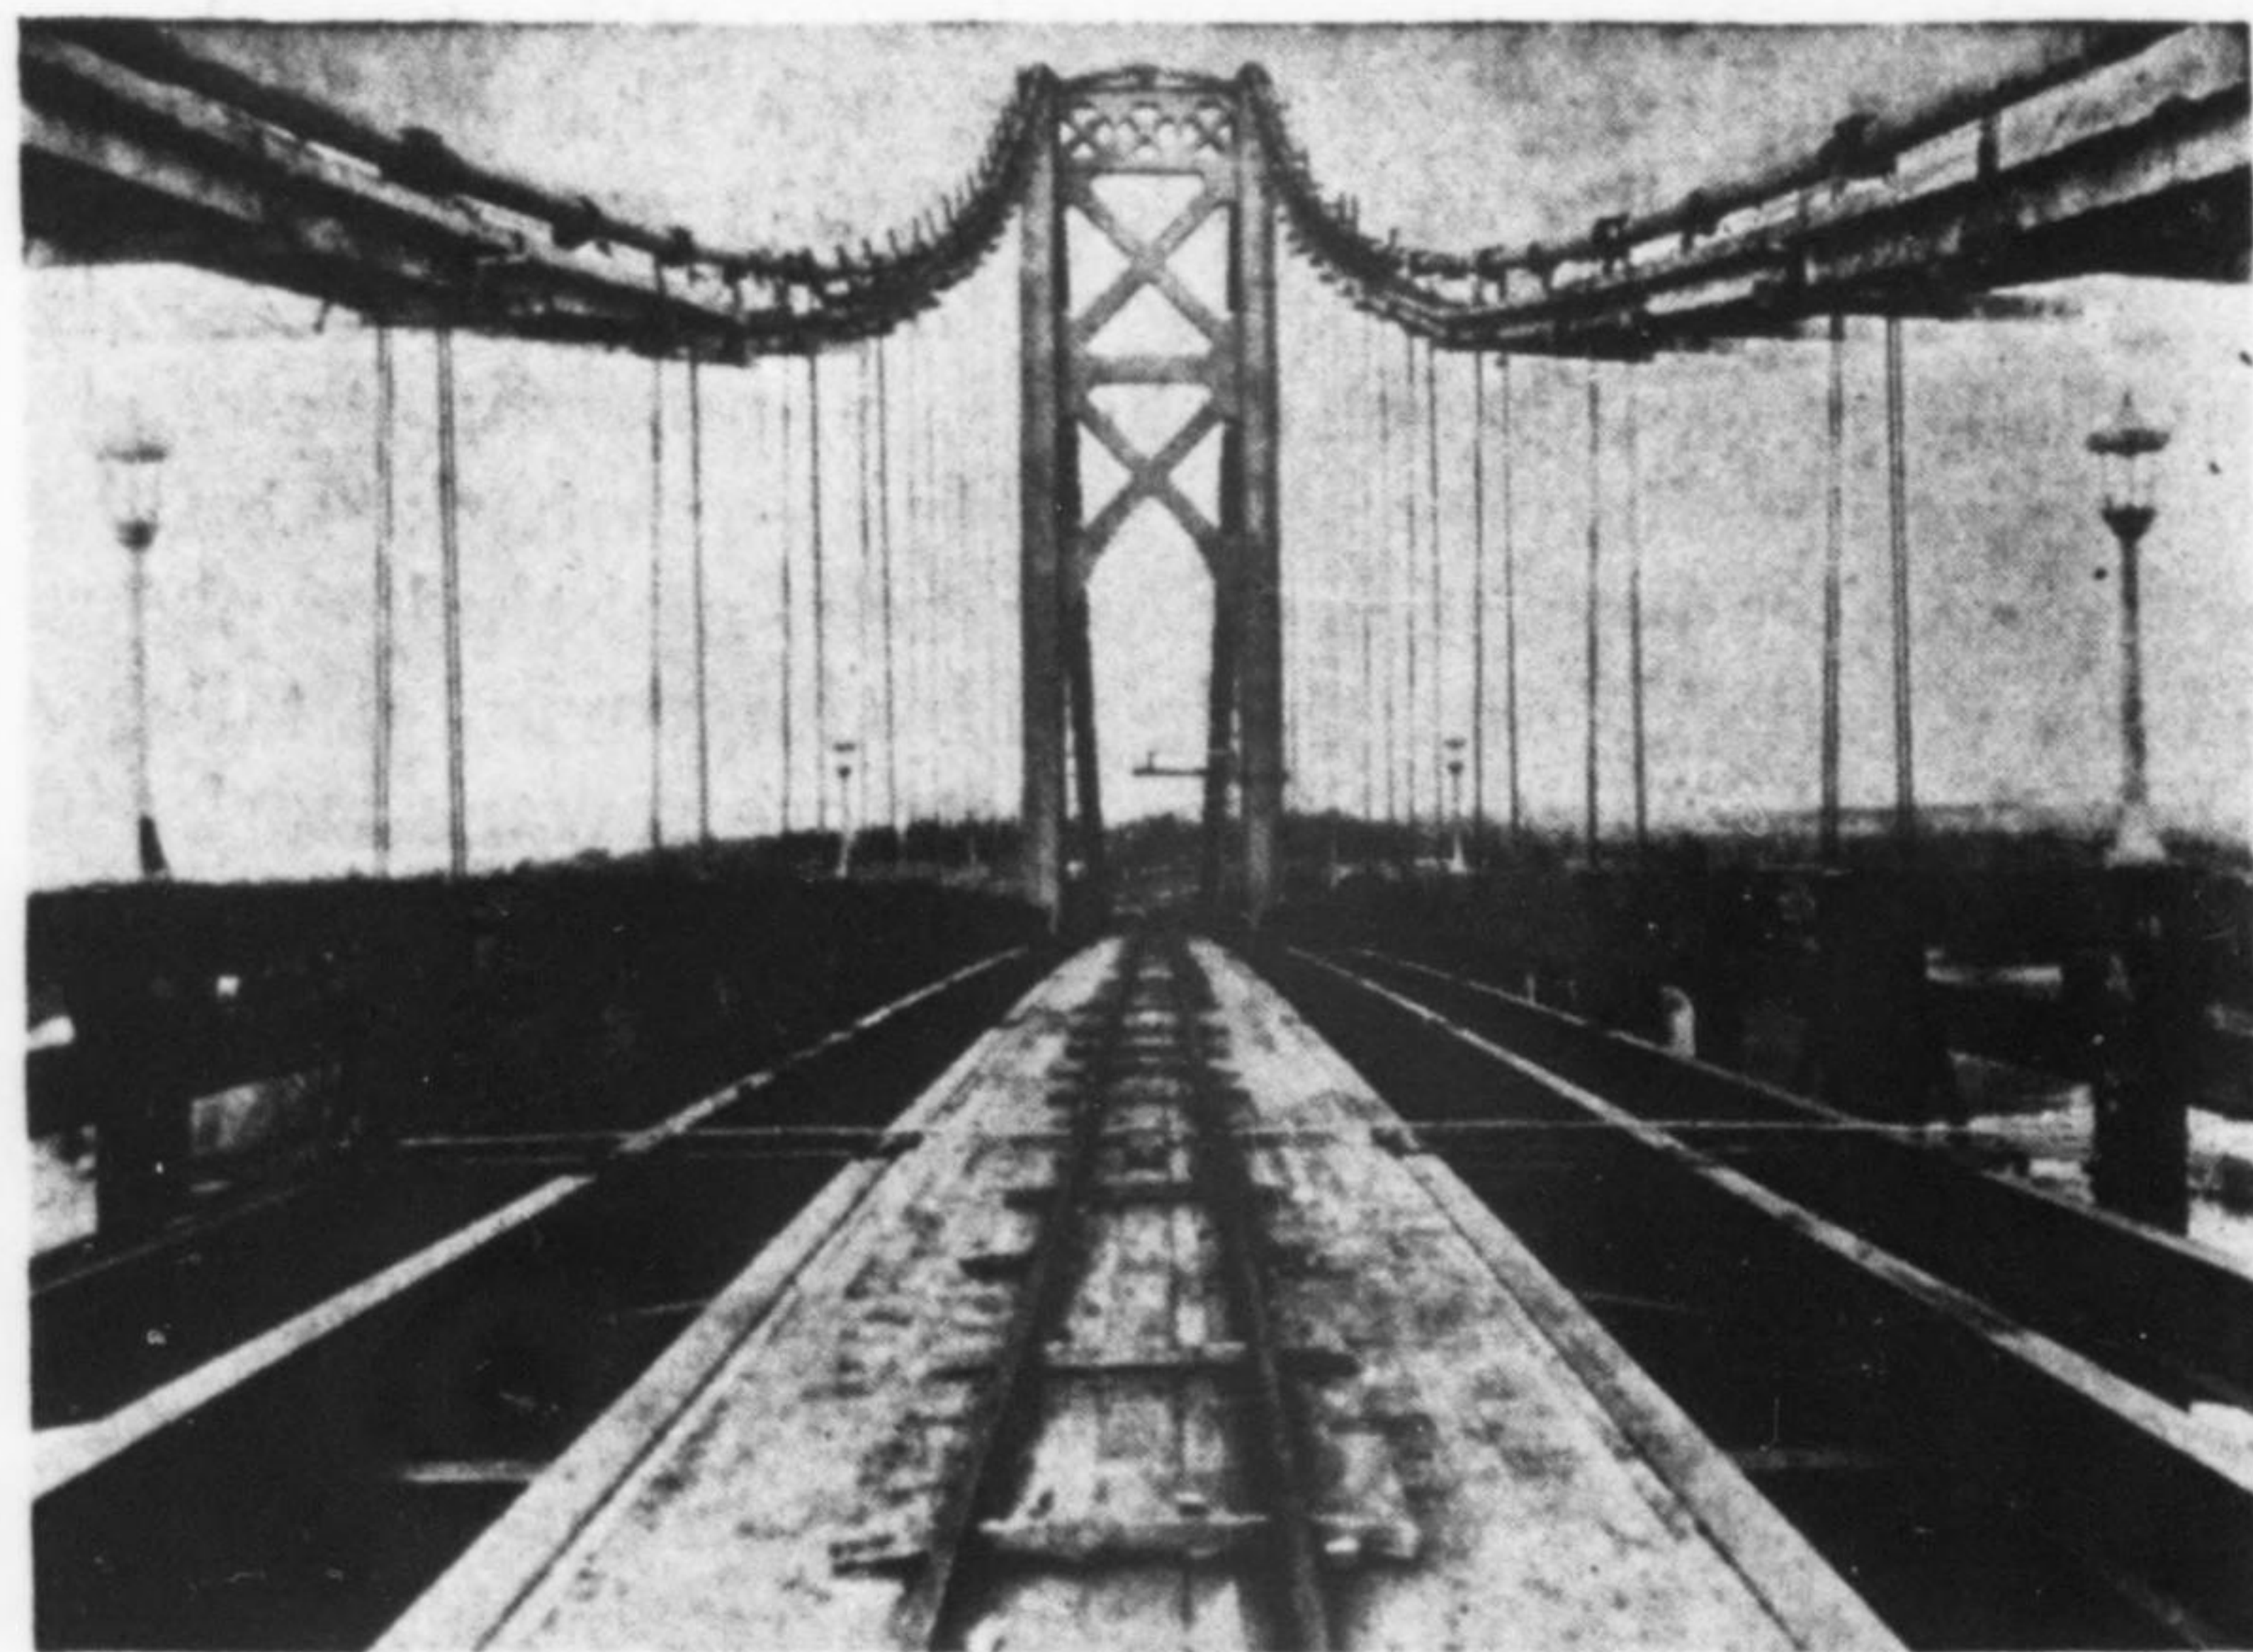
MOUNT HOPE BRIDGE JUST PRIOR TO DISMANTLING
